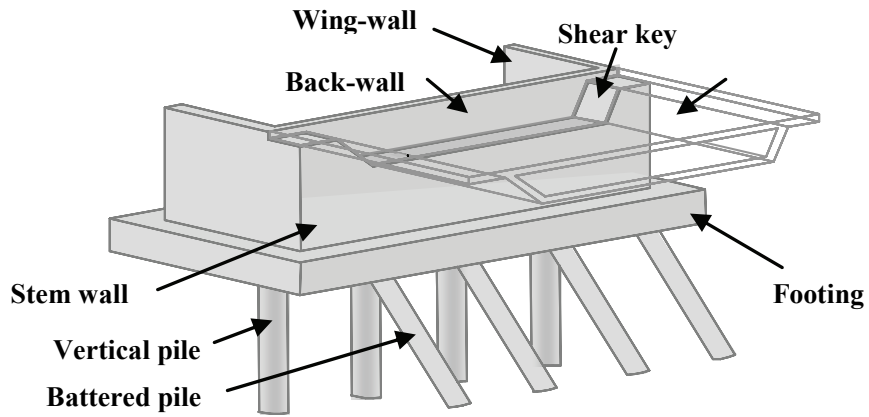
Elements of a Bridge Abutment (Megally et al., 2001)
